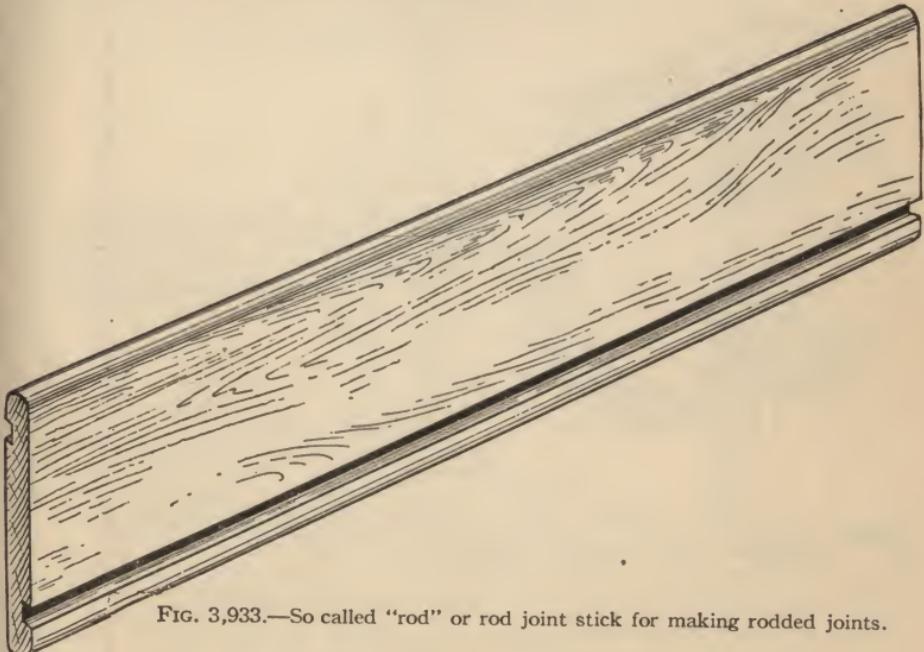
,933.—So called "rod" or rod joint stick for making rodded joints.
